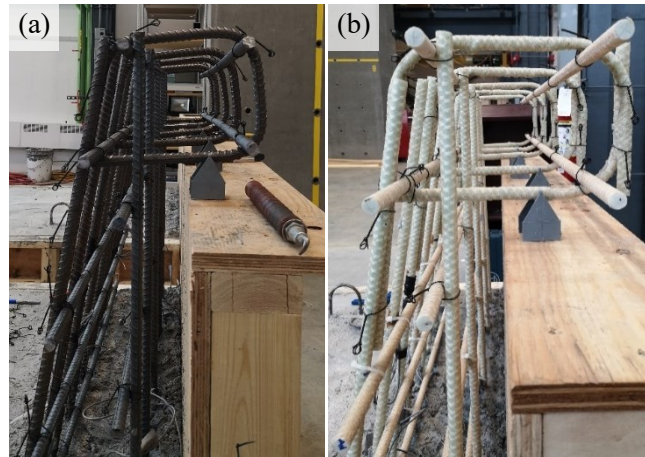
Final reinforcement layout fabricated for barrier of (a) SP-01, and (b) SP-02.
